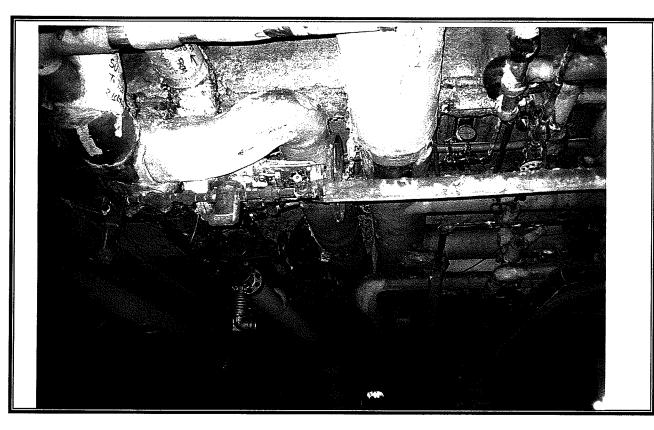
Photo Date 12/05/06 McCurdy Building High pressure steam piping
